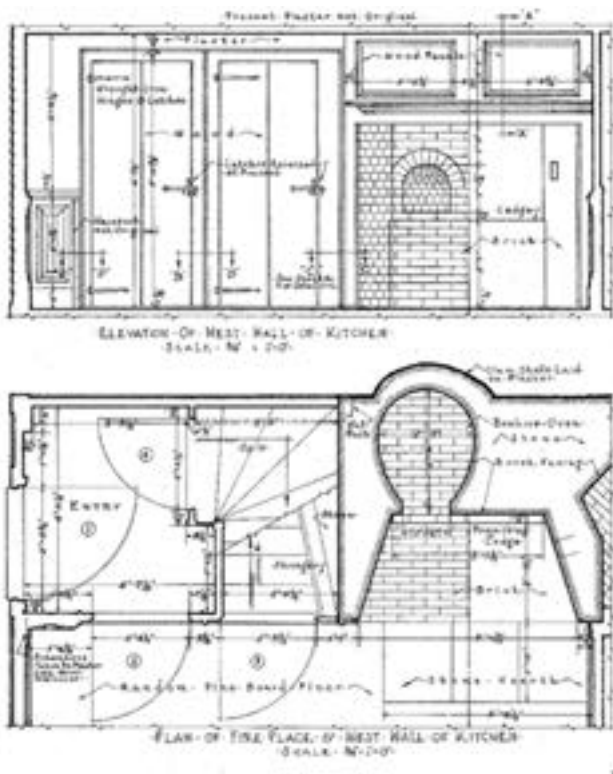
Oven detail from John Tripp House, Providence RI, c1725 (HABS). This oven, although earlier and remote from the 1797 addition, shows how a typical oven might have been located.
